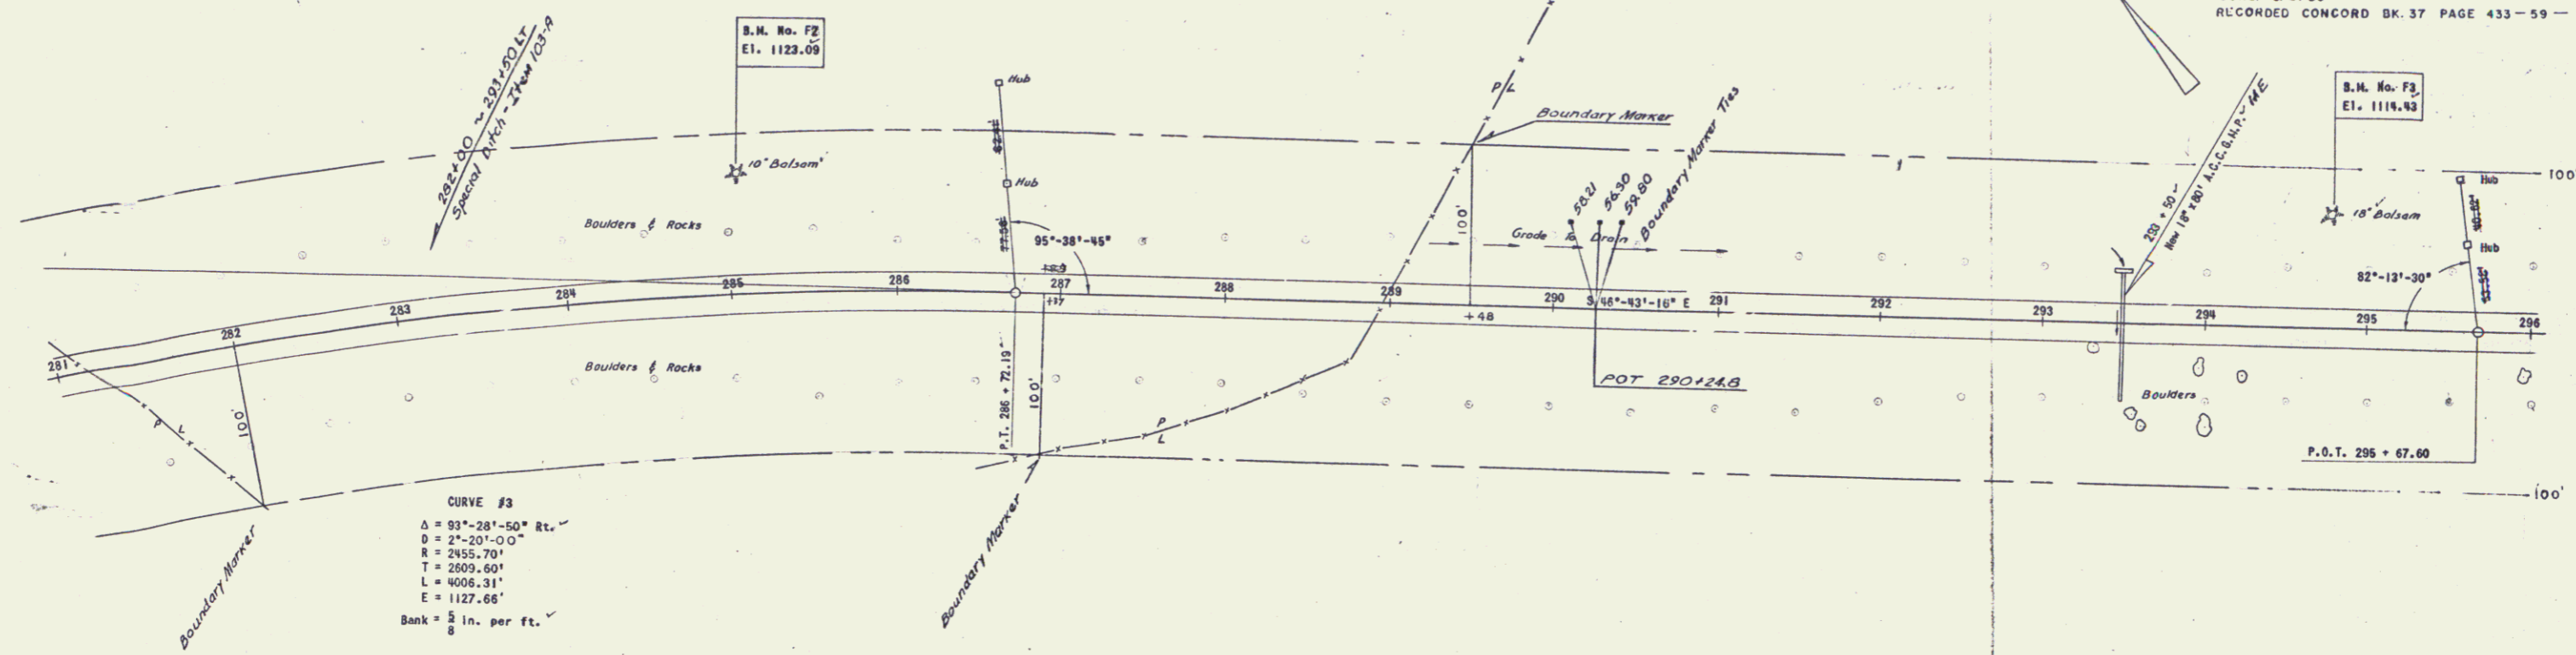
PLAN, PROFILE, D.P.R. & E. STANDARD
